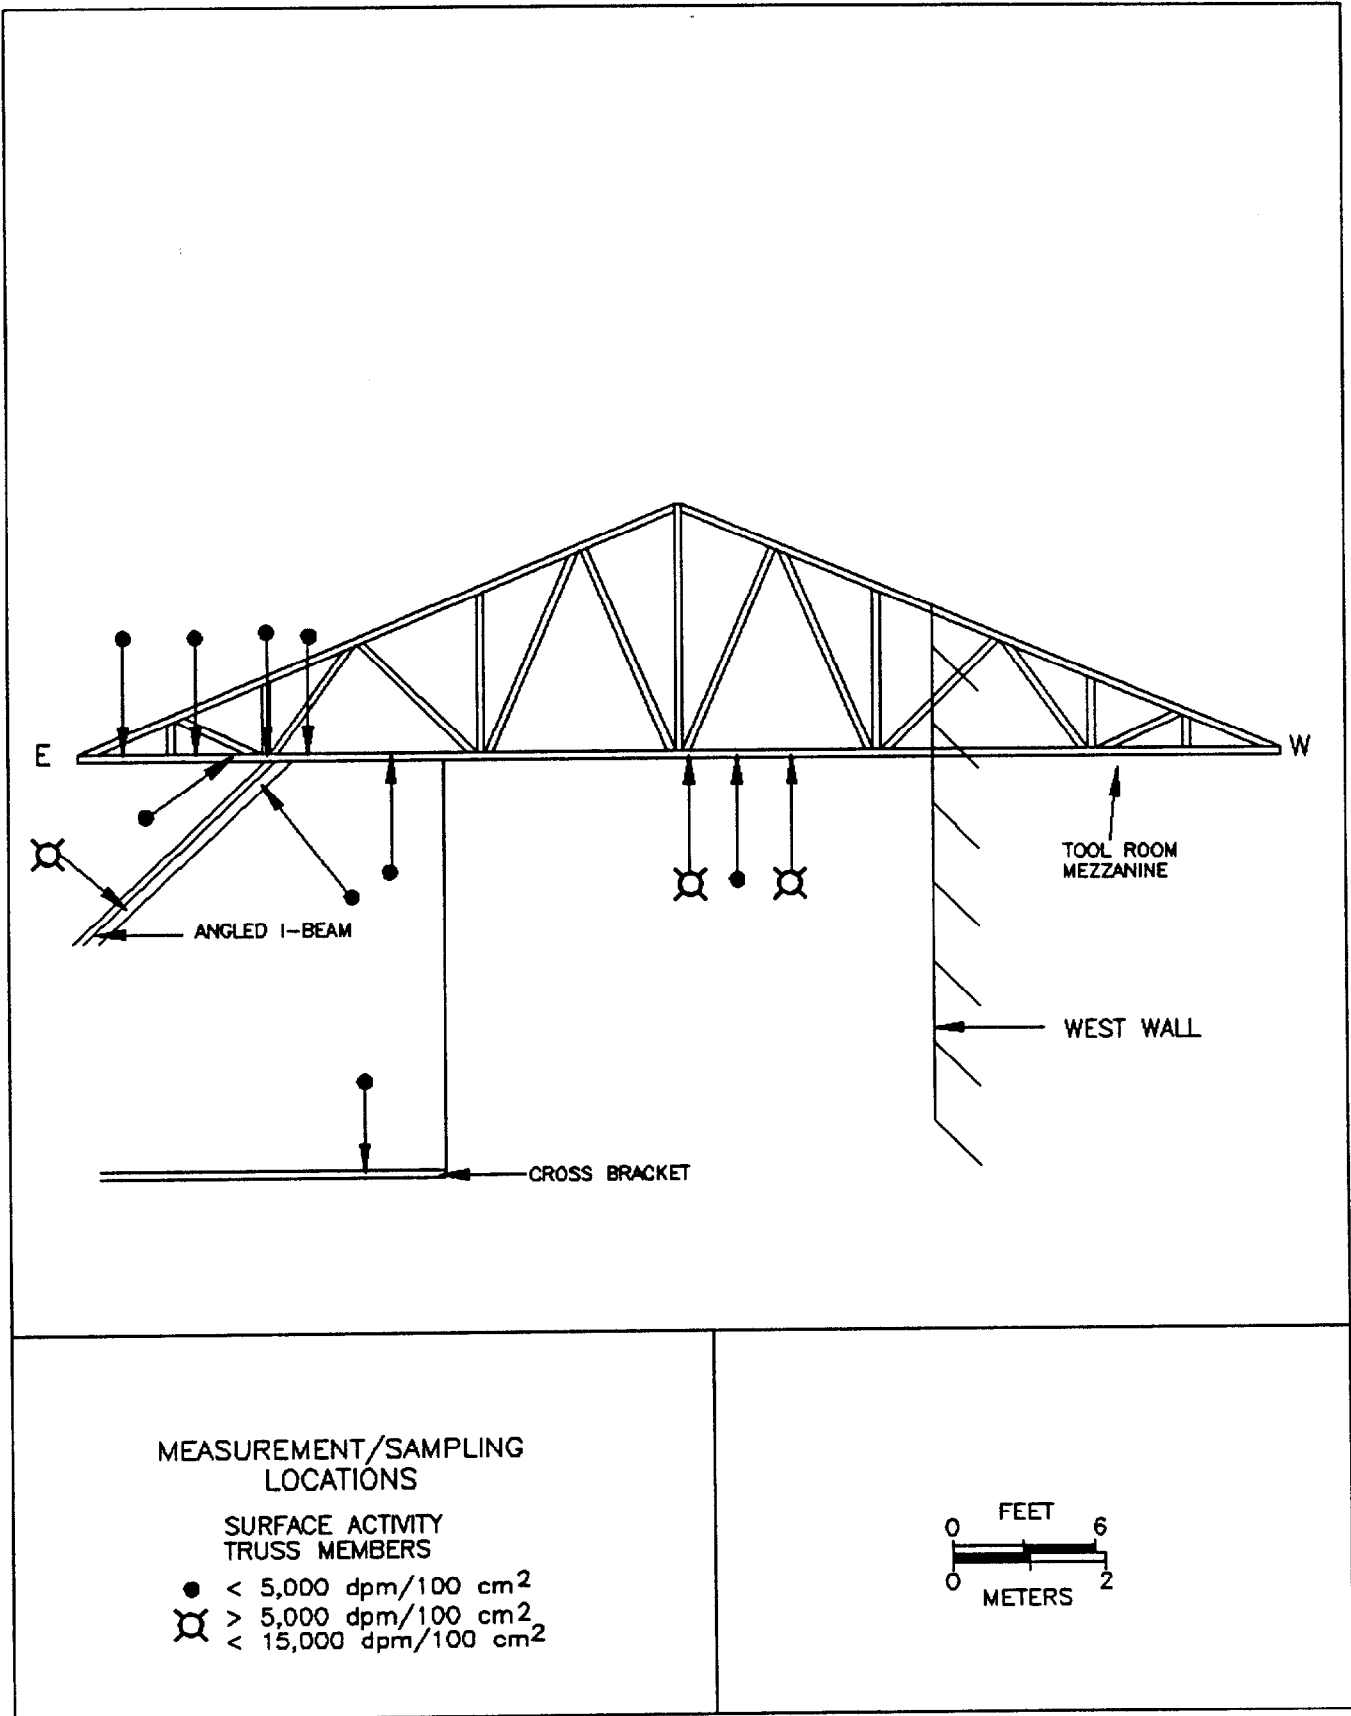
Building 8, Truss 3 – Measurement and Sampling Locations
